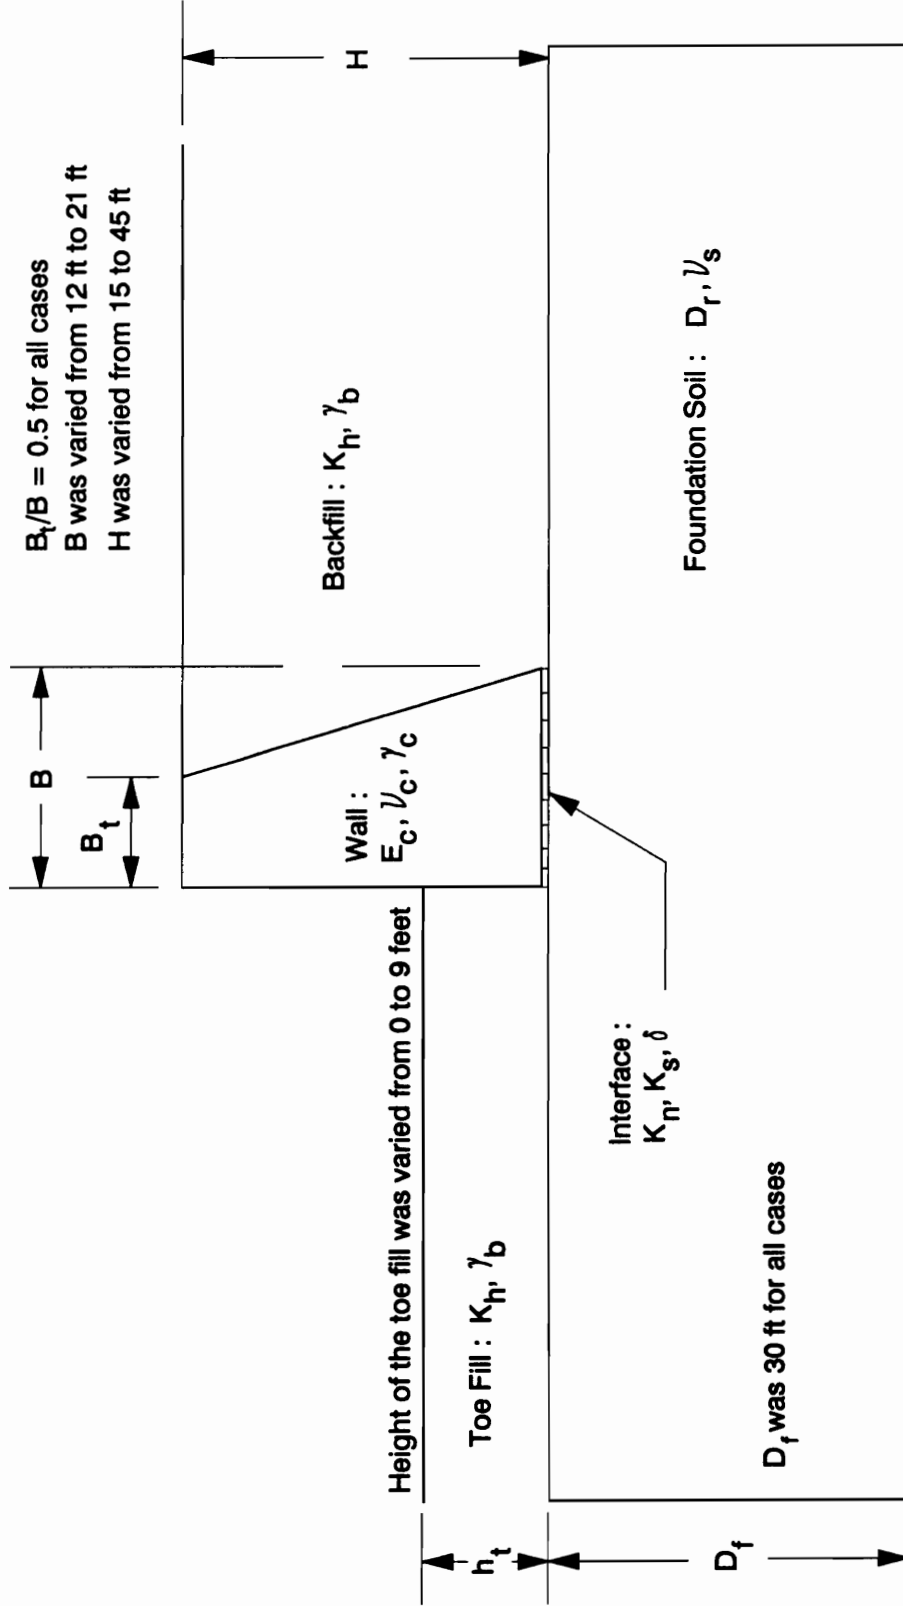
Hypothetical Wall-Foundation System used for Following Load Analyses Showing Parameters
